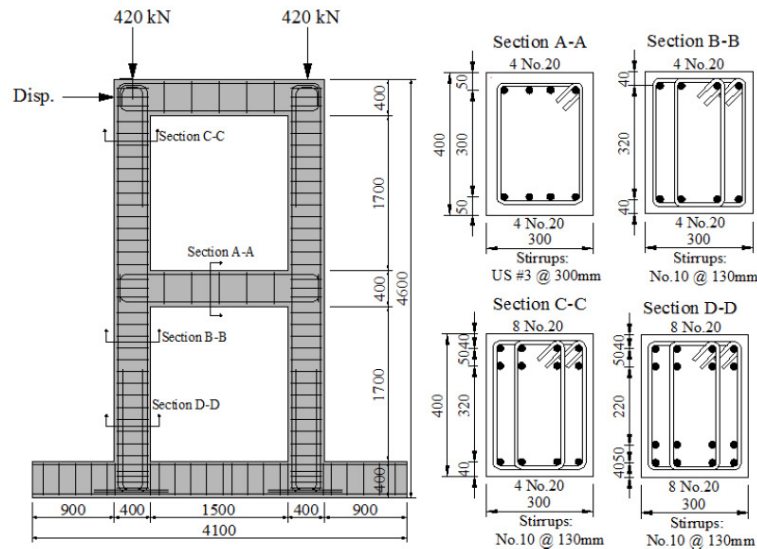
Duong et al. (2007) frame reinforcement layout and cross-section detailing
